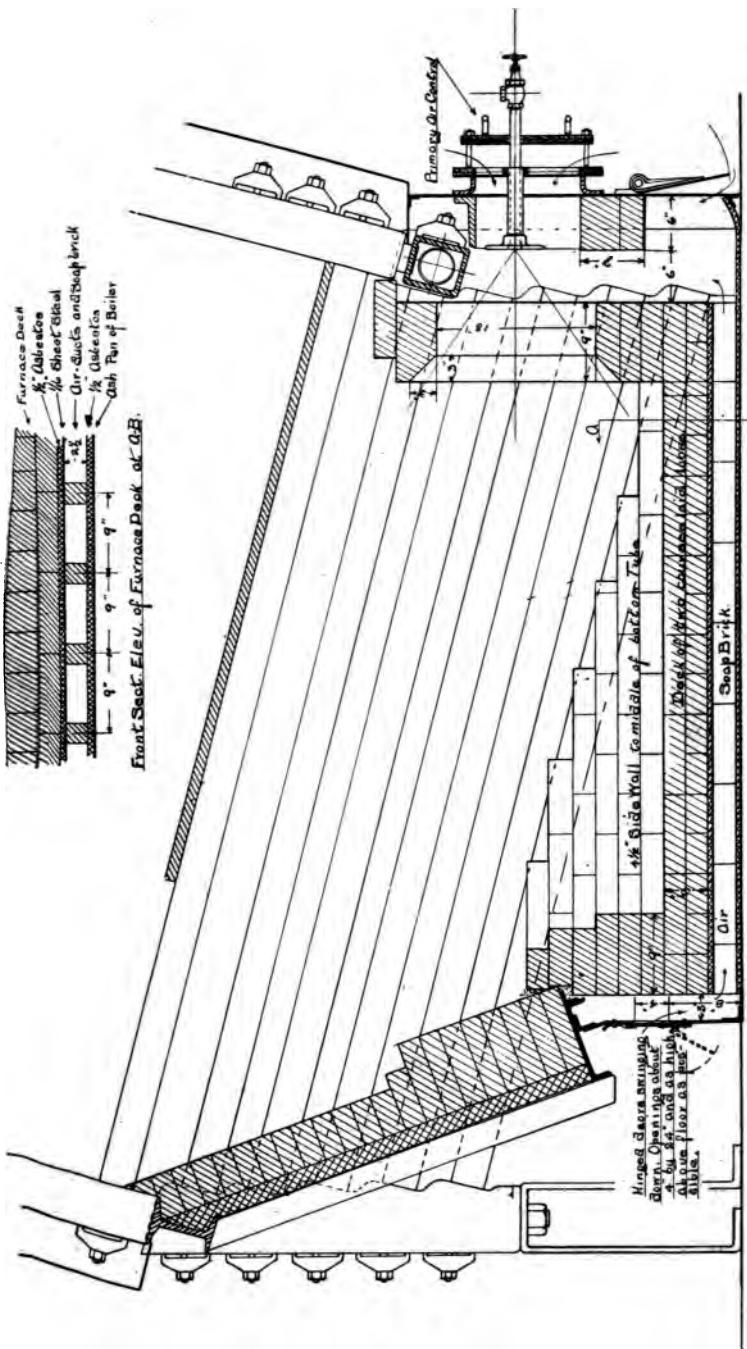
Furnace Arrangement Under B. & W. Boller.
